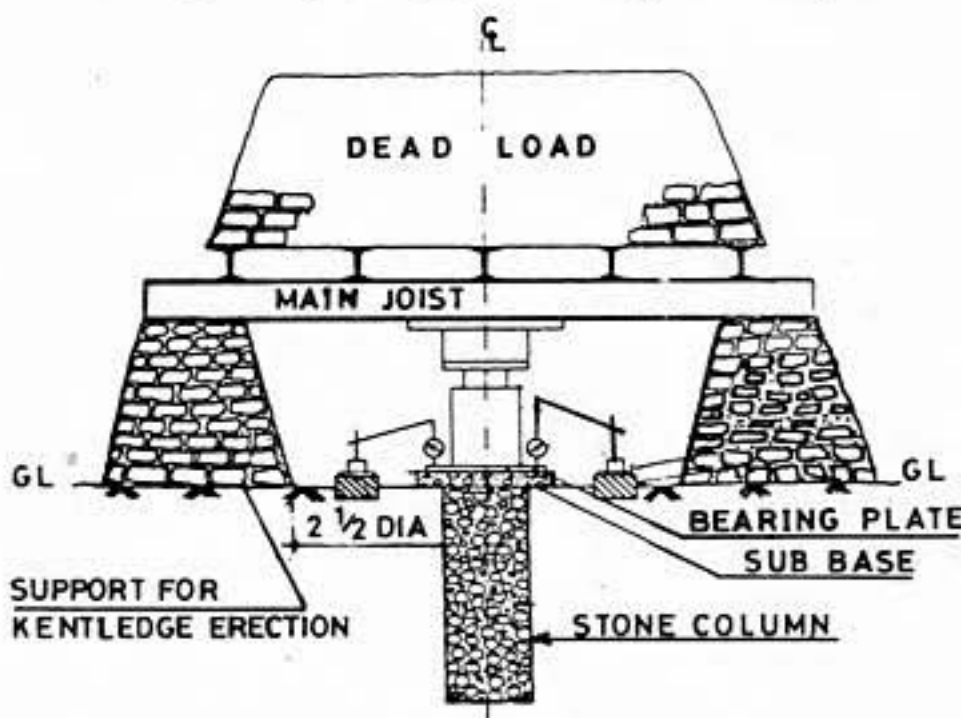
TYPICAL ARRANGEMENT FOR SINGLE STONE COLUMN LOAD TEST
